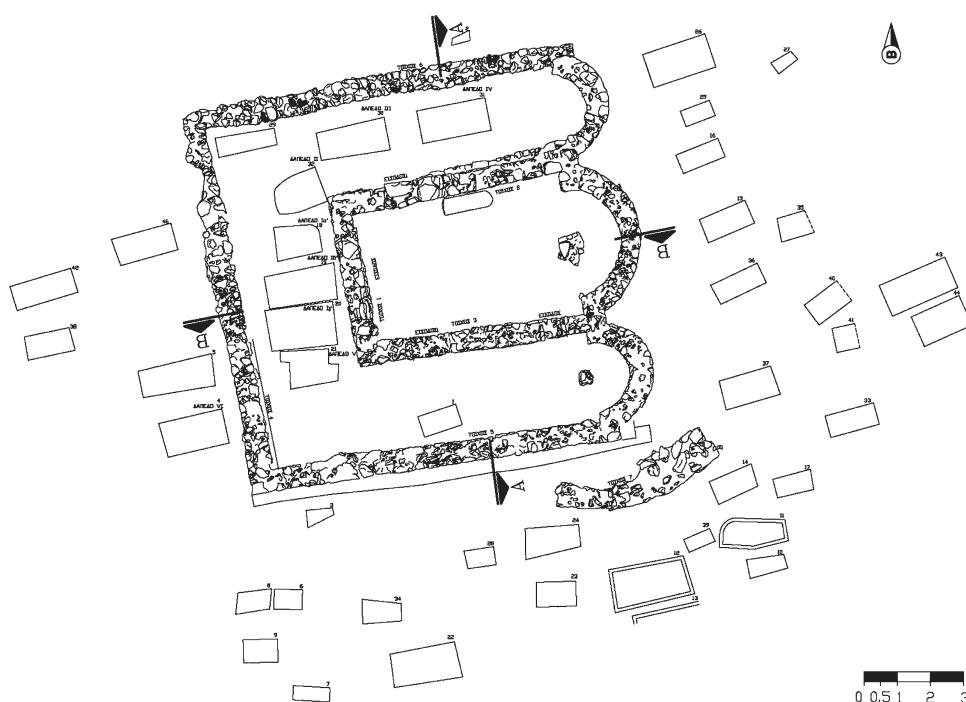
Plan of the church with excavated graves. – (Plan S. Sdrolia).
